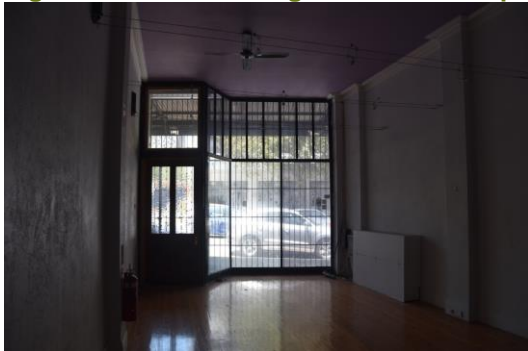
View west of the ground floor shop to the front of the building. Note removal of original ceiling.
